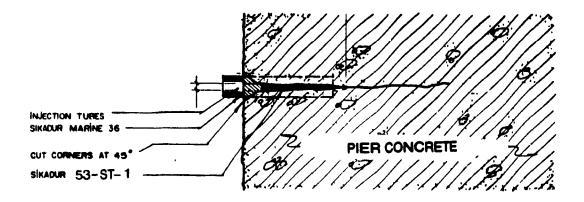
REPAIR OF NARROW CRACKS
